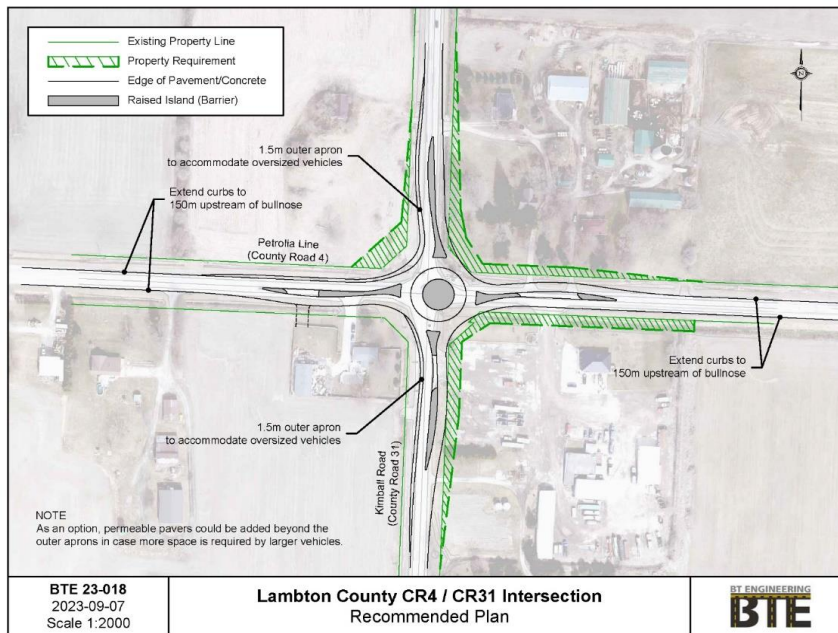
County Road 4 (Petrolia Line) and County Road 31 (Kimball Road) Recommended Plan
